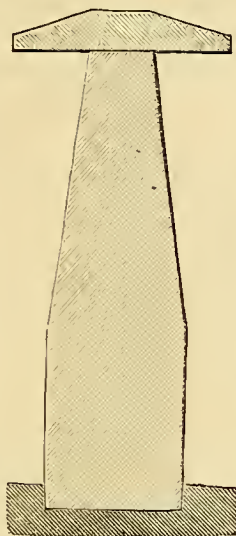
GRANITE OR WOOD PILLAR—SECTION.
